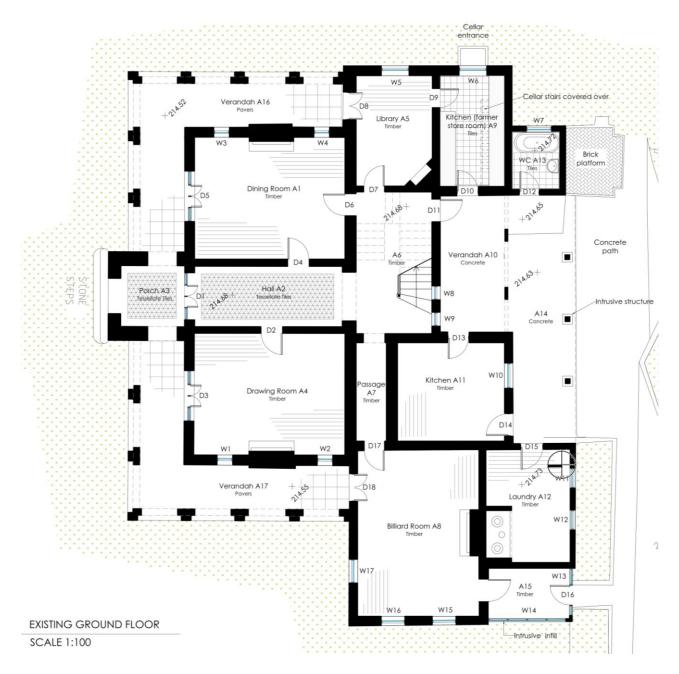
Existing ground floor plan. Not to scale. Site measured and draw by TTA.
